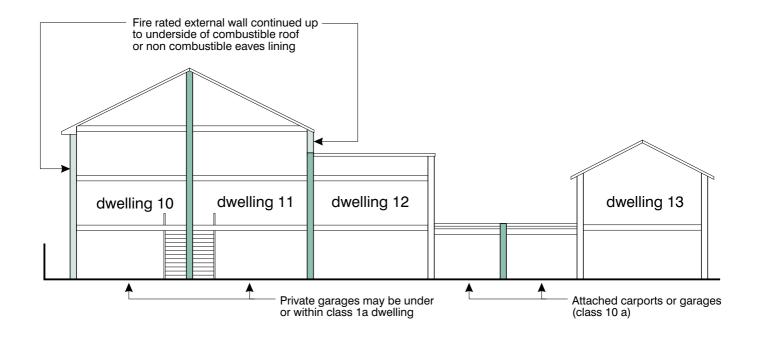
TYPICAL CLASS 1a BUILDINGS
